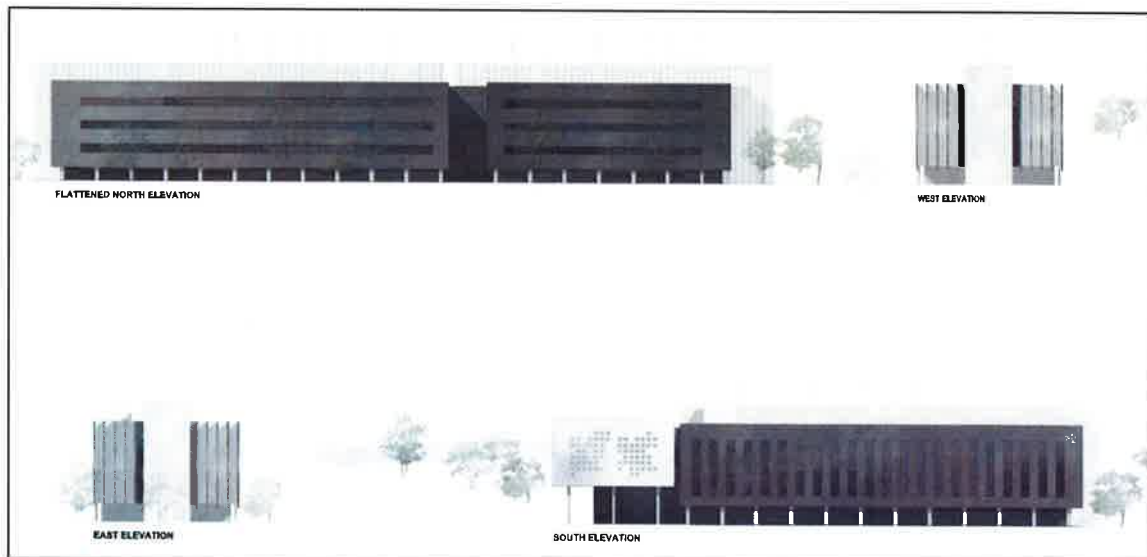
Approved elevations of the HMRI building (Source: MP 08_0250)
